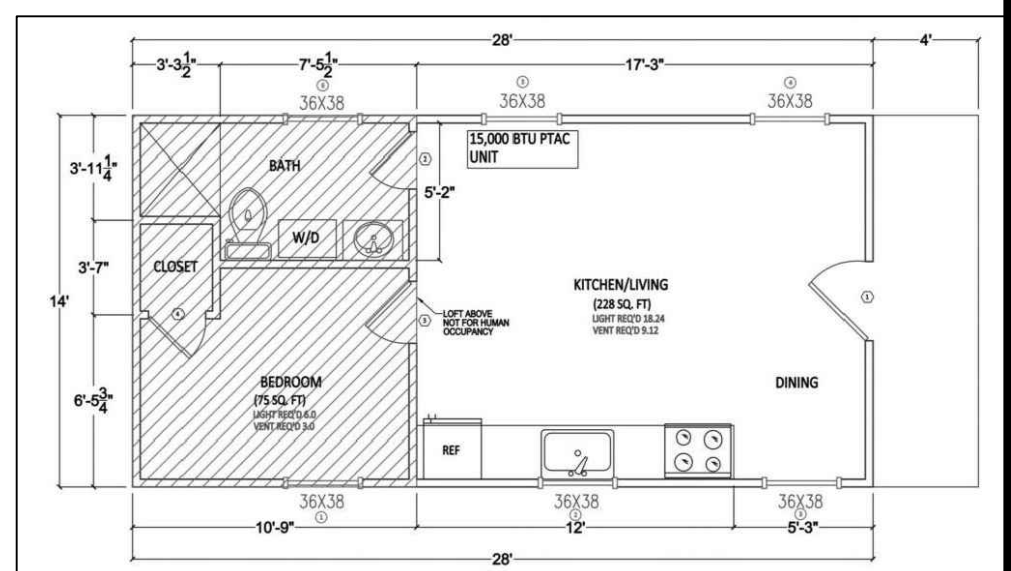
DEER RUN "MOOSE" CABIN FLOOR PLAN
